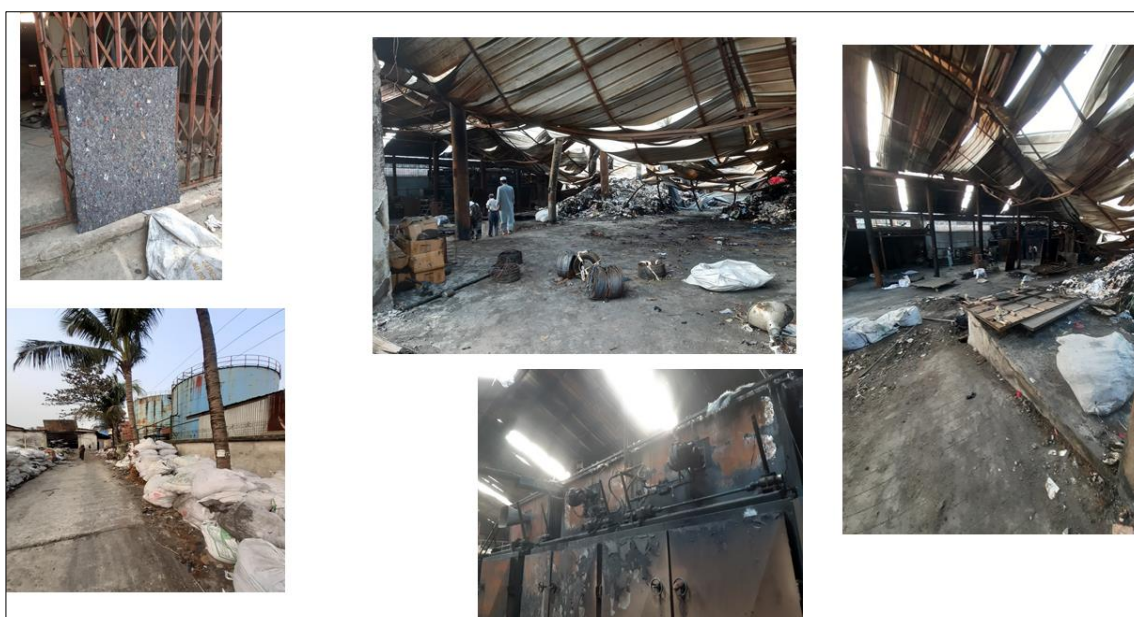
Sample Photographs of burnt machineries of Kader Trading Company
